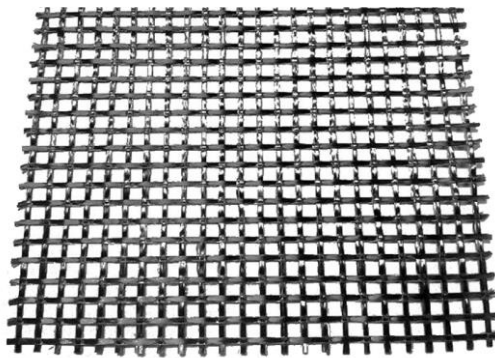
Mixed basalt-steel reinforcement used in the current study (Marcari et al., 2016)
